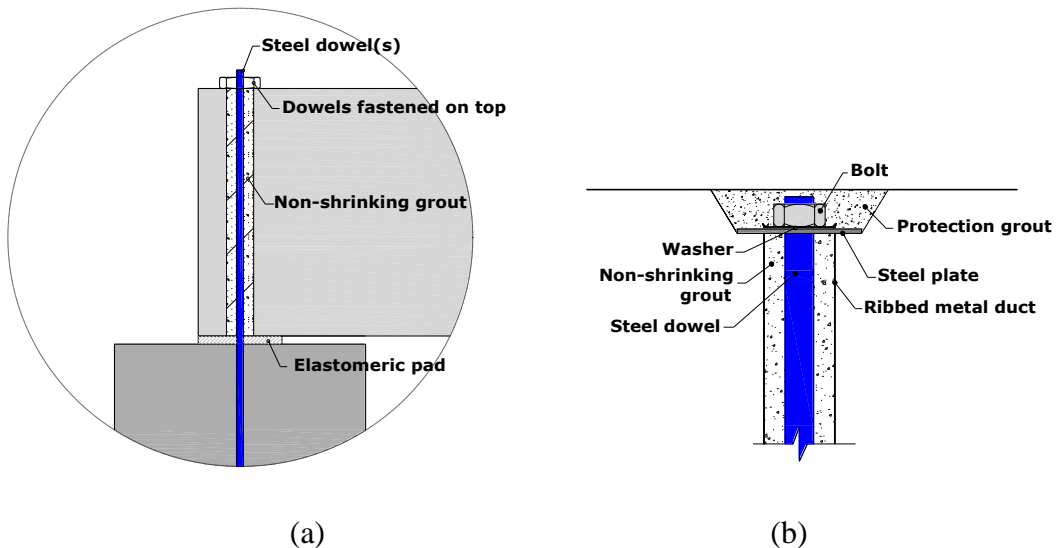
(a) Detail of a typical precast pinned beam-to-column connection; (b) Detail of fastening at the top of the dowel.
